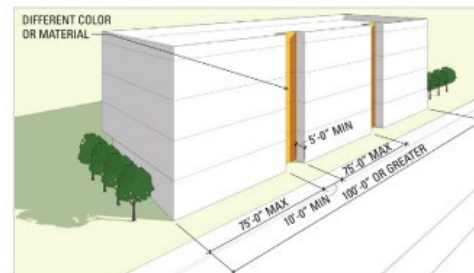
Division of building length; 100' or wider mid- and high-rise buildings.
